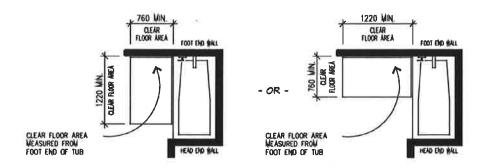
CLEAR FLOOR AREA AT TUB
